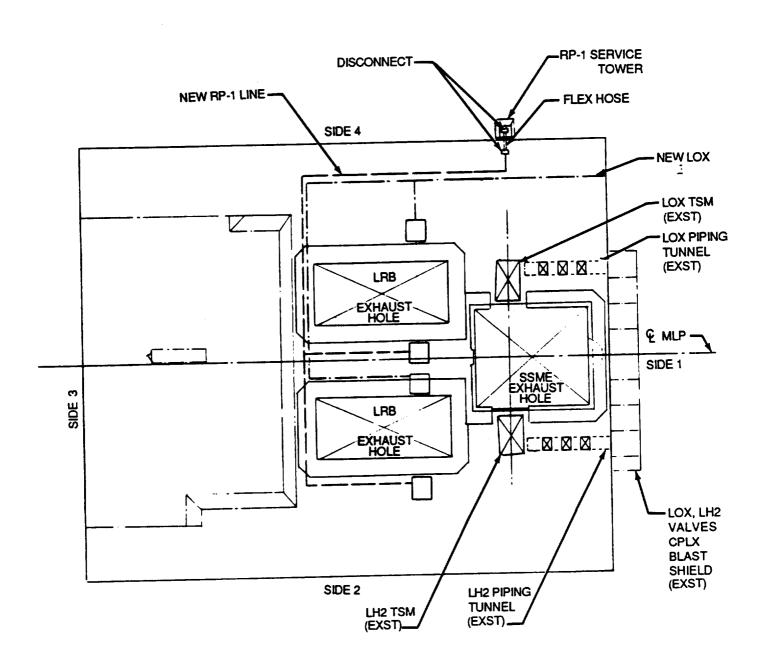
MLP Propellant Tunnel Concepts (Plan View).
